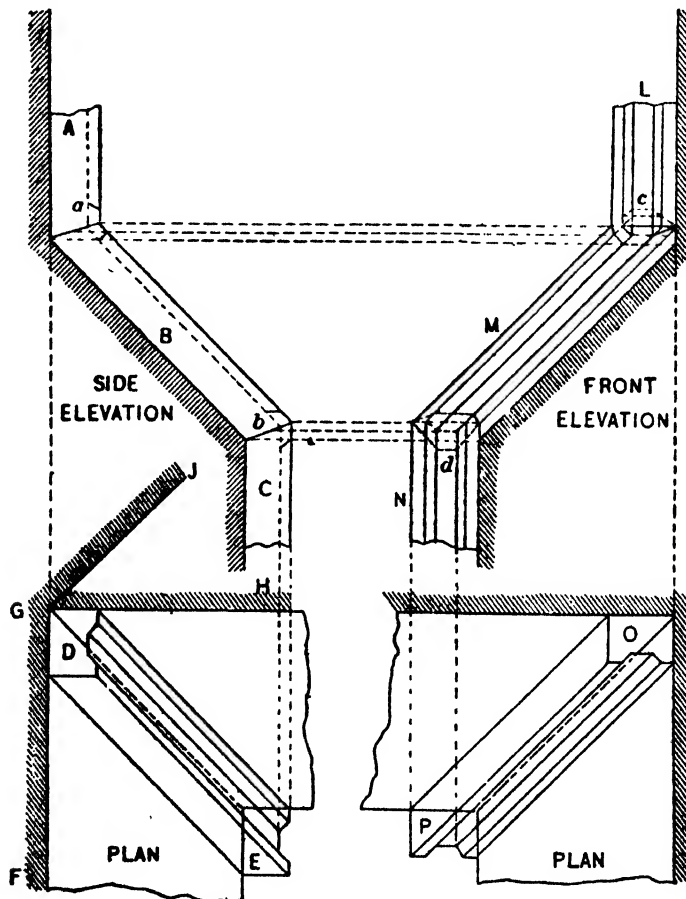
Plans and Elevations of Leader Pipe Elbow
